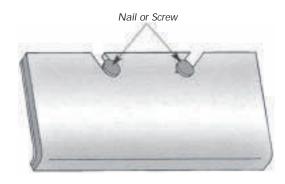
Ridge and/or Under Eave Course Notched and Fastened
